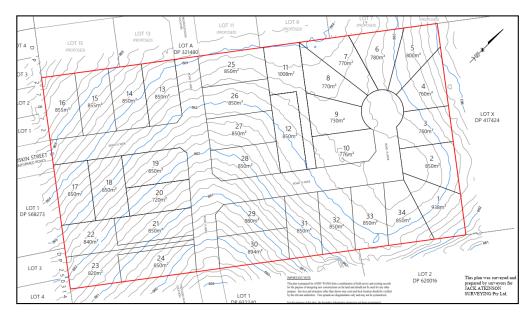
; Extract of Proposed Subdivision Development ex Jack Atkinson Surveying Pty Ltd
